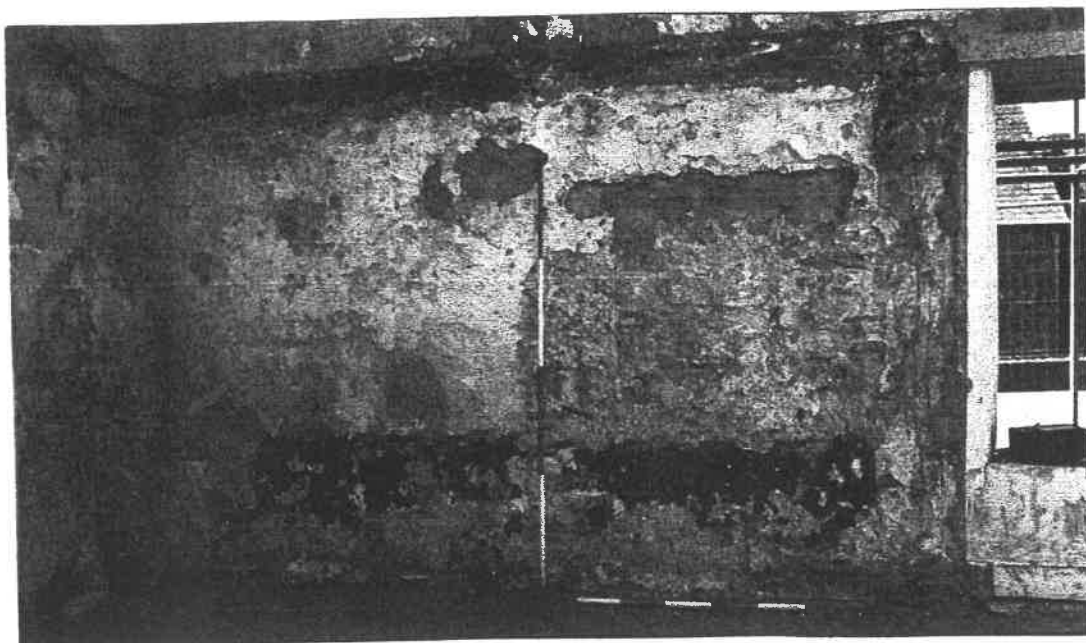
The upper part of interior of south wall (U) - camera facing south.
